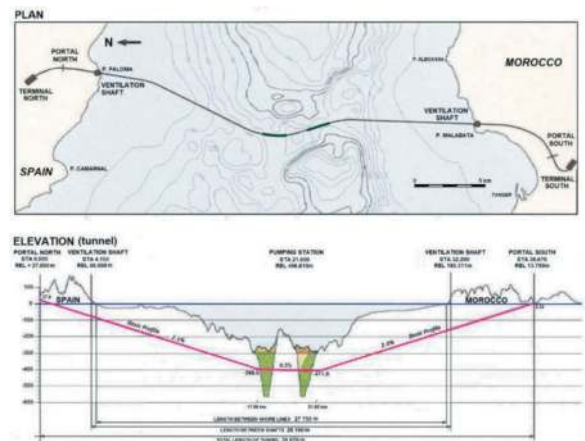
Gibraltar strait tunnel. Plan and longitudinal section.
